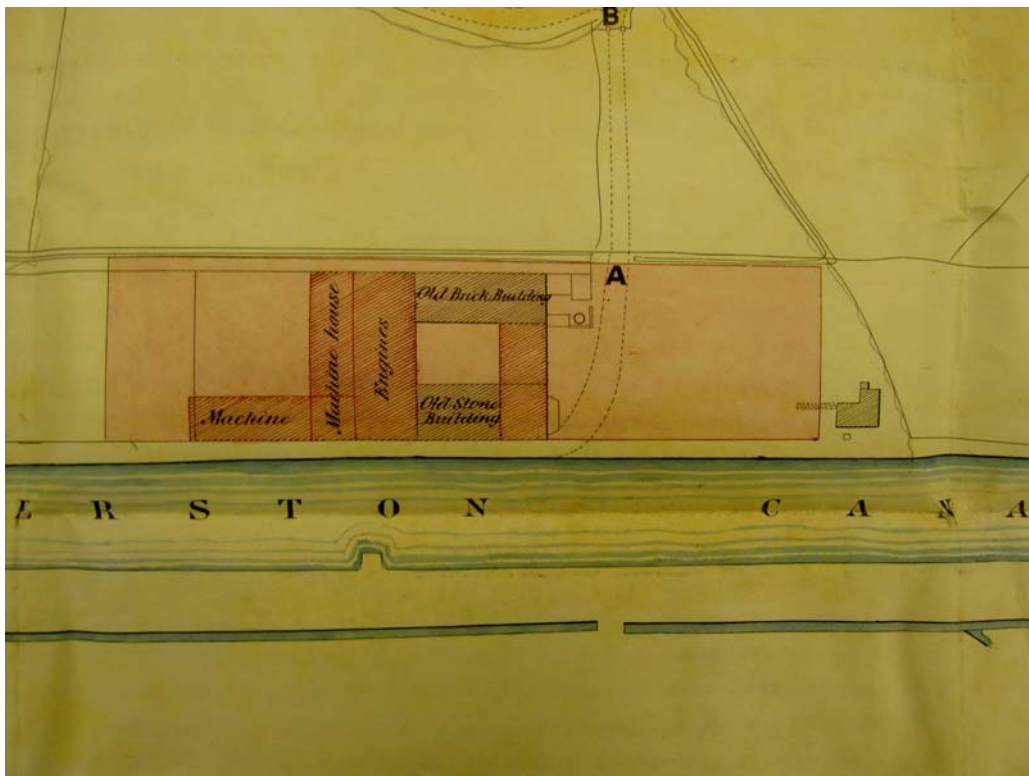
Plan of the house (right) and paper mills in 1882 (BSUD/U/C Box 4 7/1 1882)
